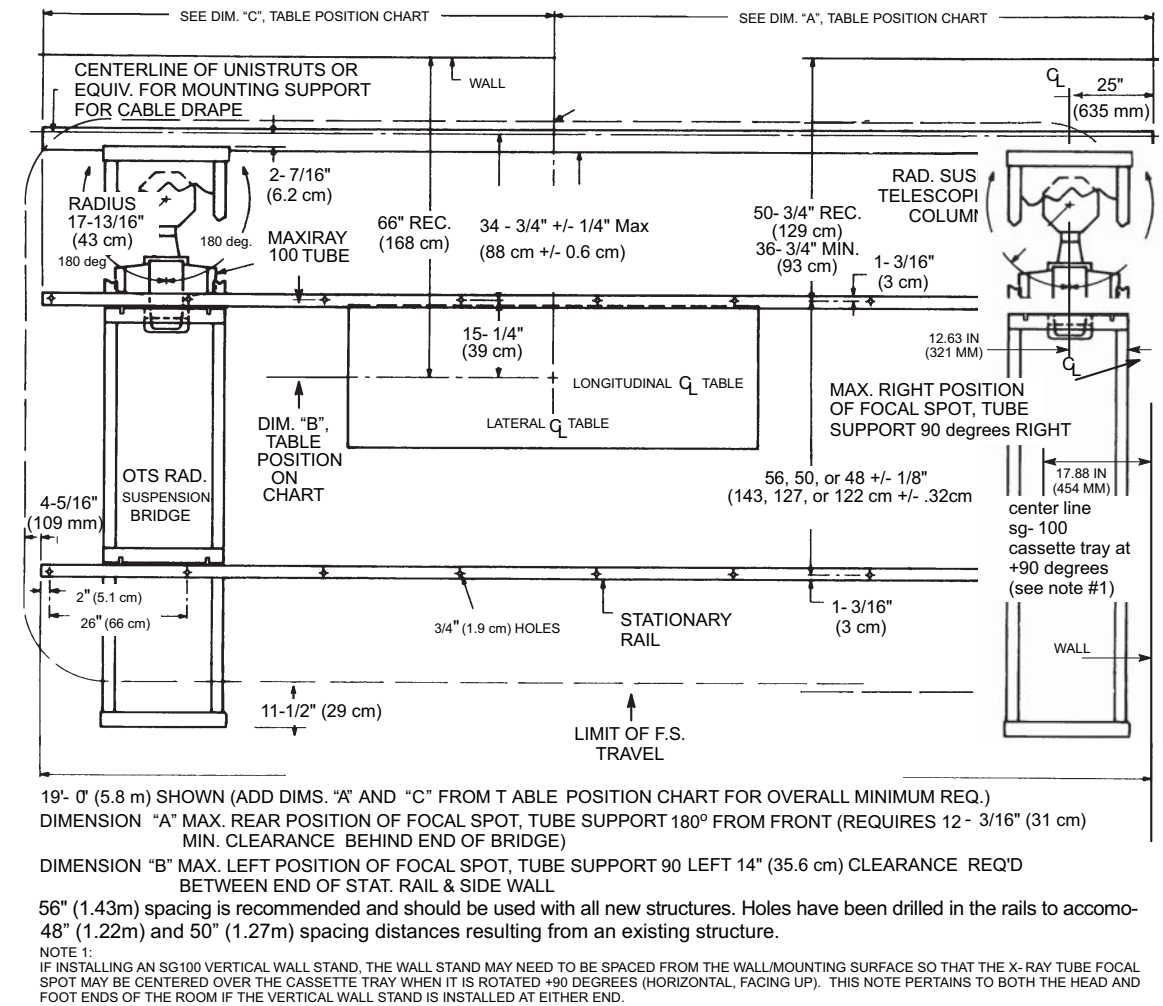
OTS Suspension Plan View - (All Dimensions Minimum)
